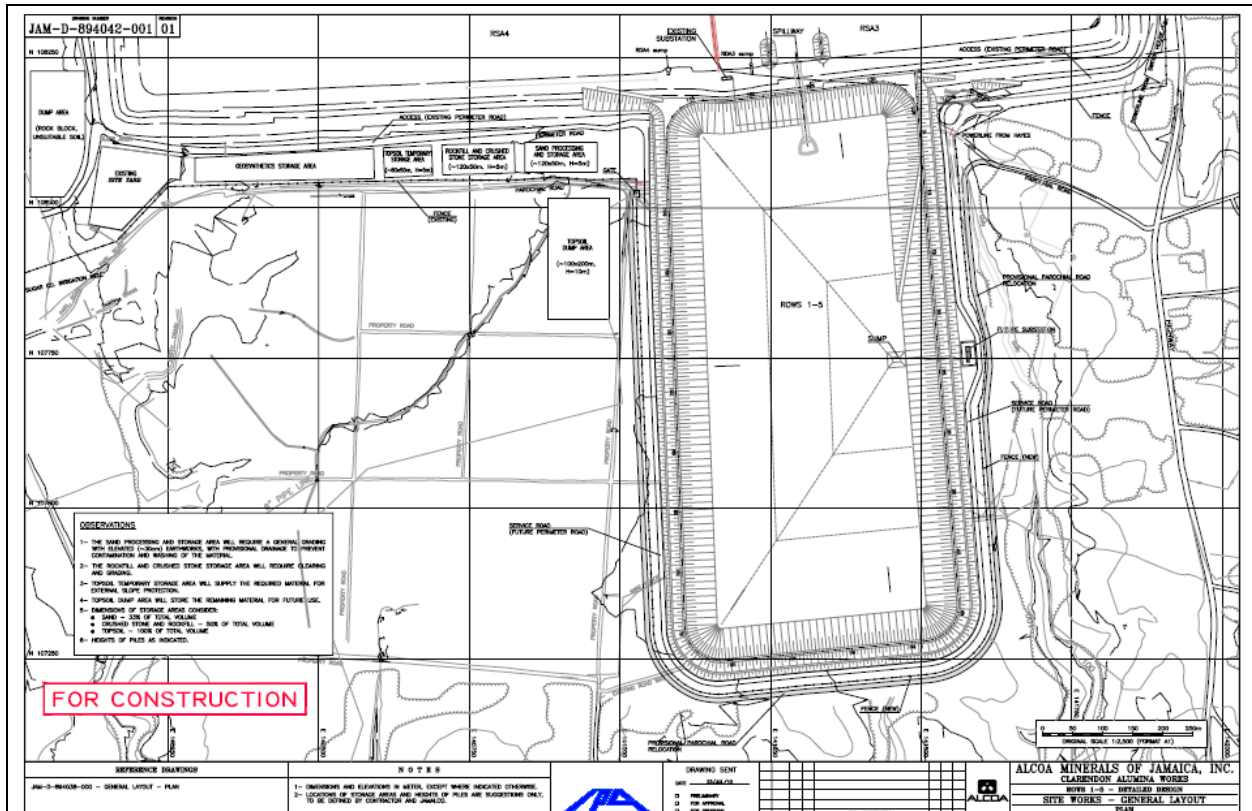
Site Layout Plan (See Appendix 3 for Full Image)
